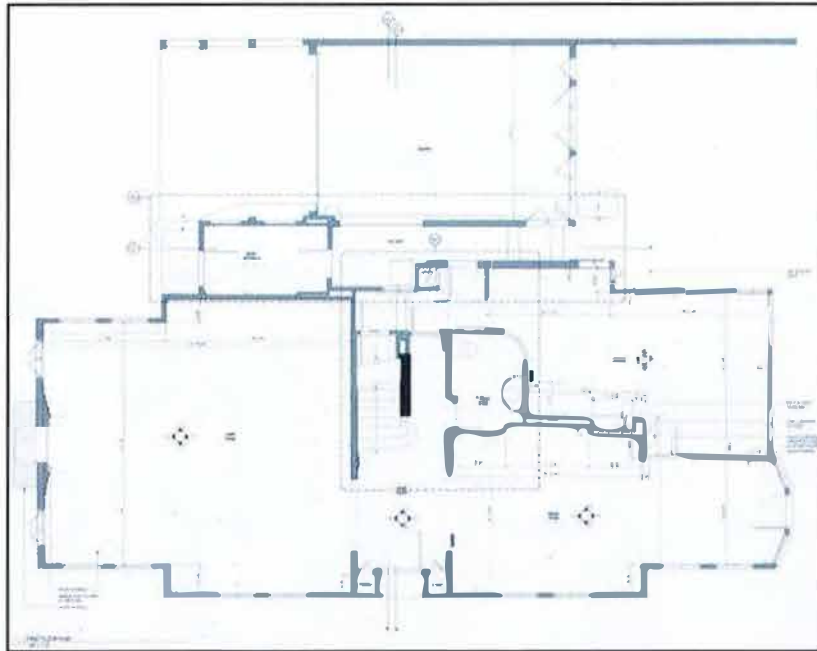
As-Built plan of first floor, 2017 (Revel Architecture & Design).
